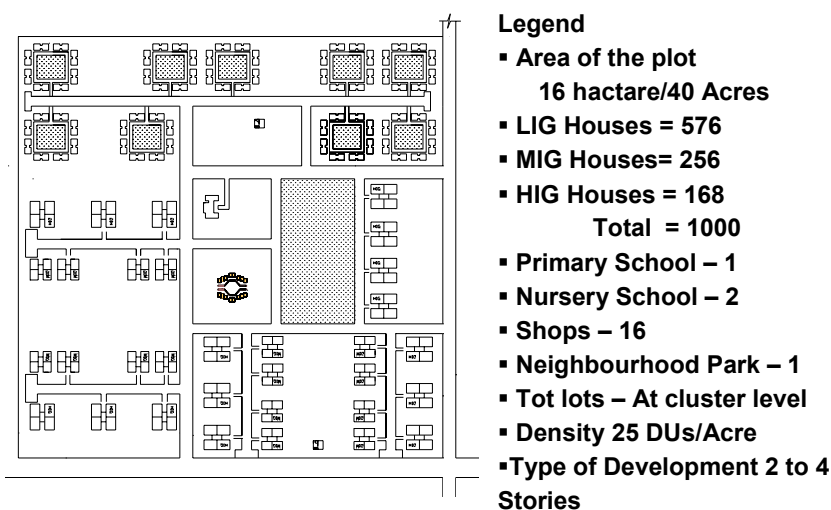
Settlement layout plan for a neighborhood of 5,000 population, Alternative – I
